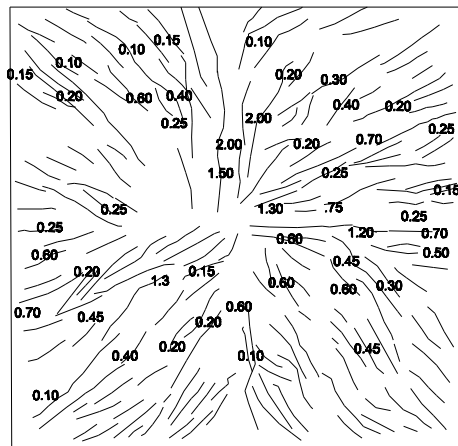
Tension face of specimen SY150f15-a after testing (Numbers indicate crack widths in millimeters)
